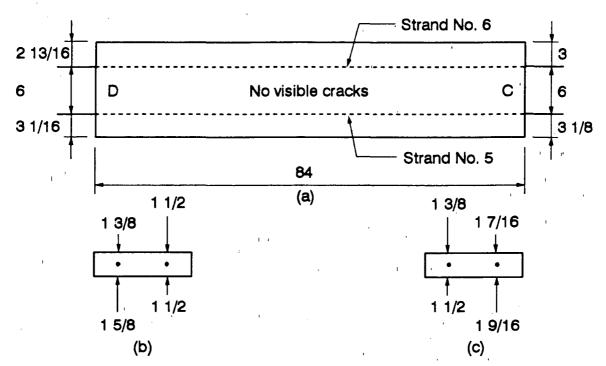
Specimen No. 4-3.0TC-9 (dimensions shown in inches):
